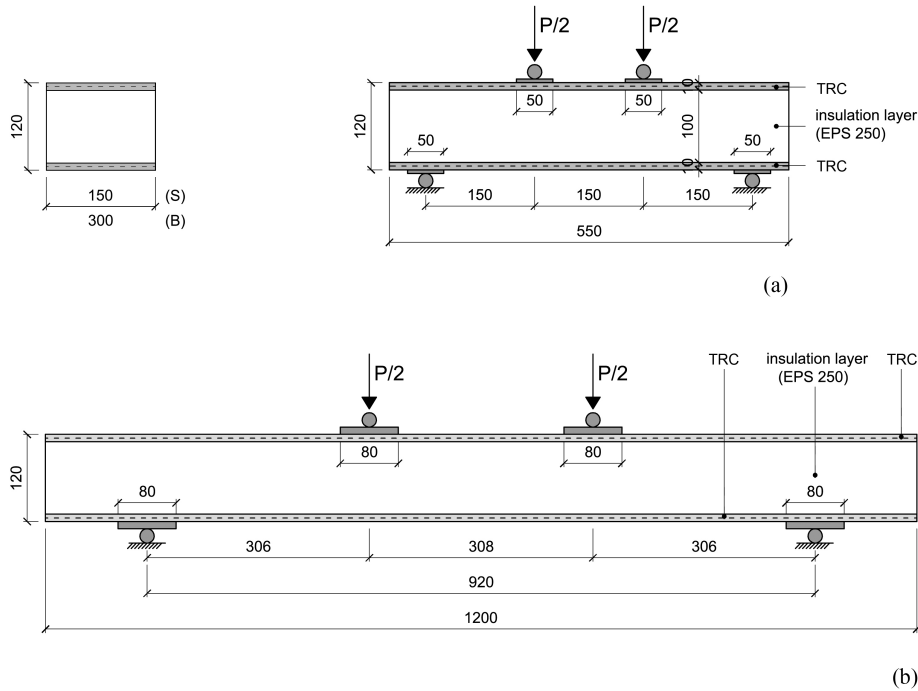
Sandwich beam geometry and test set-up (measures in mm): small "S" (a) and big "B" (b) specimen.
